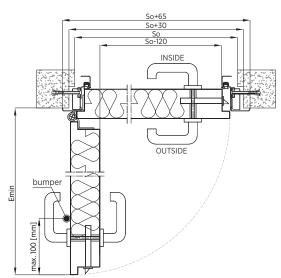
Installation of a single-leaf door in front of the opening – corner frame with a thermal break – horizontal cross-section
